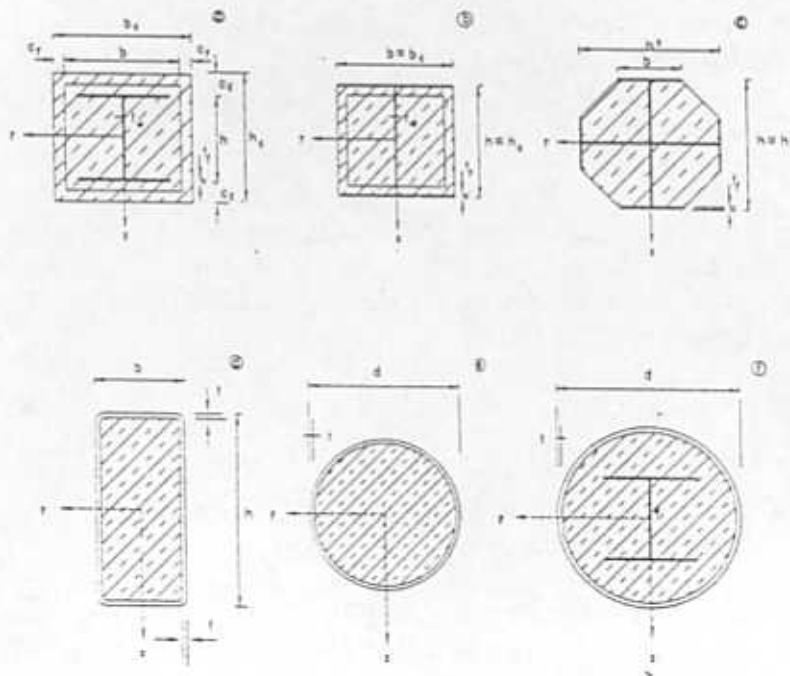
Typical Cross Section of Composite Columns, with Notation
